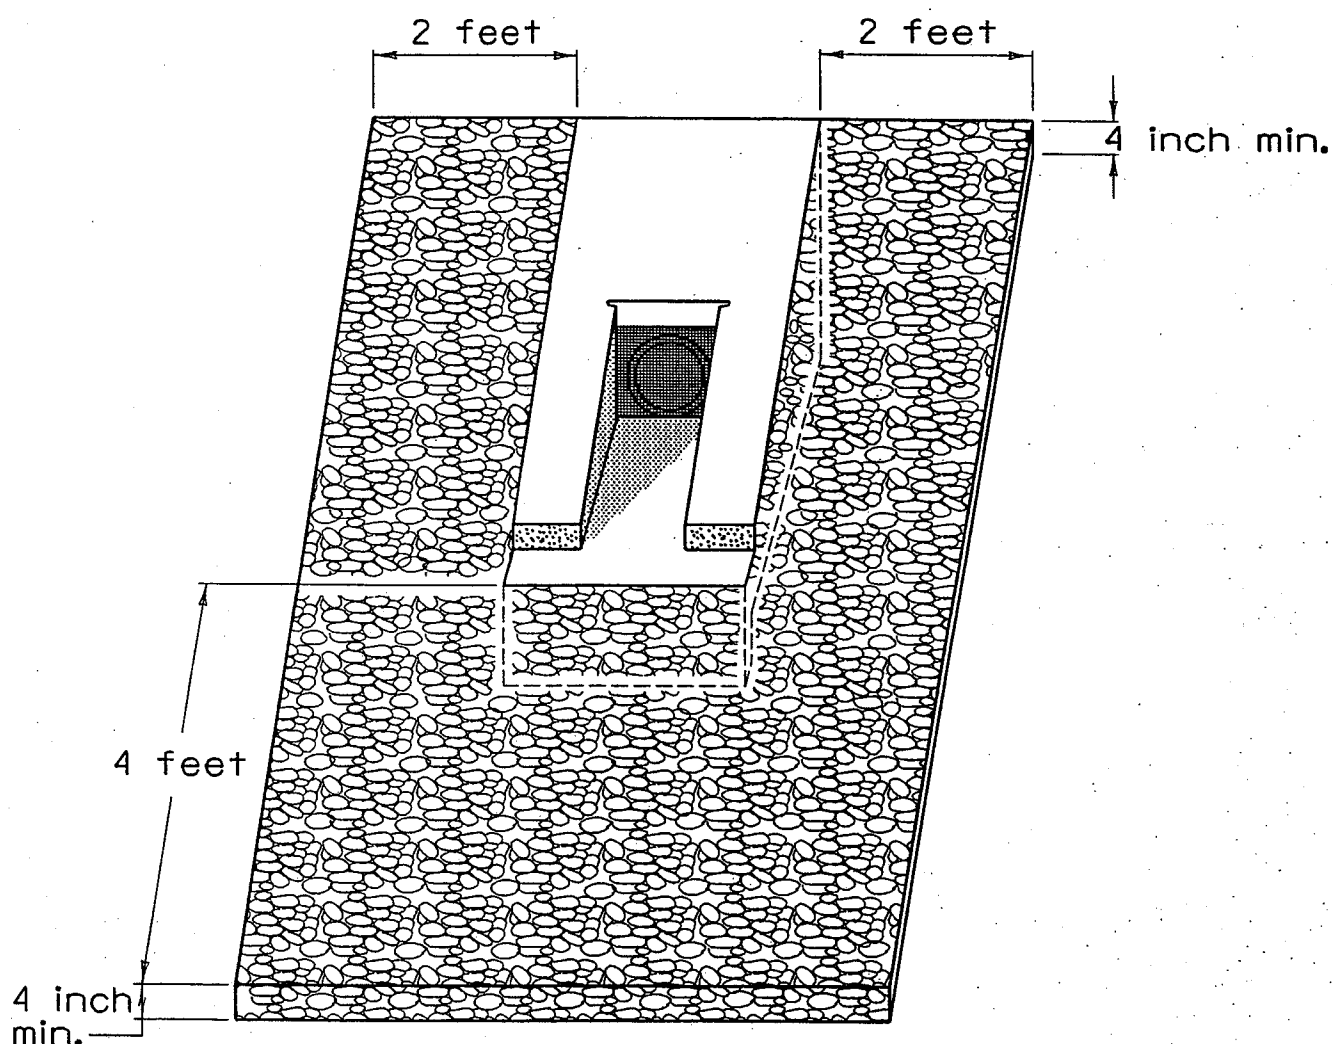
DETAIL SHEET FOR PAVEMENT SUBSURFACE DRAINAGE OUTLET
